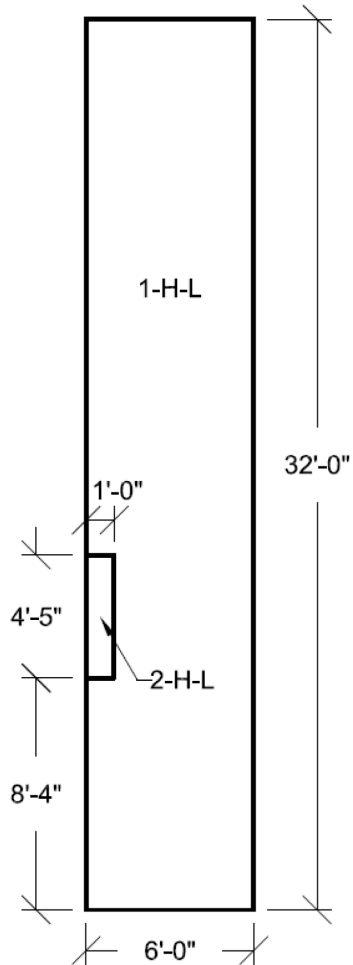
H.6-151 DGFOV Slab 3 Looking Down
